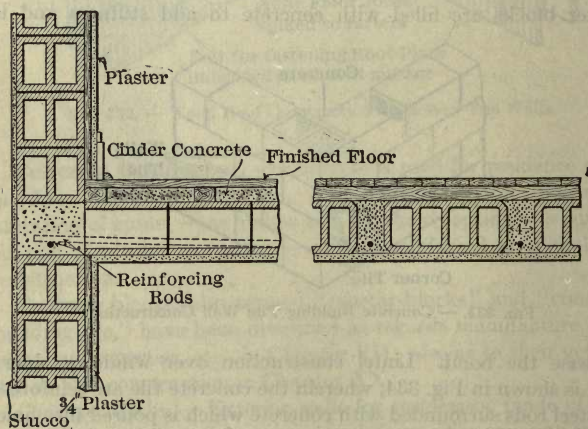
Concrete Building Tile Wall and Floor Construction.
